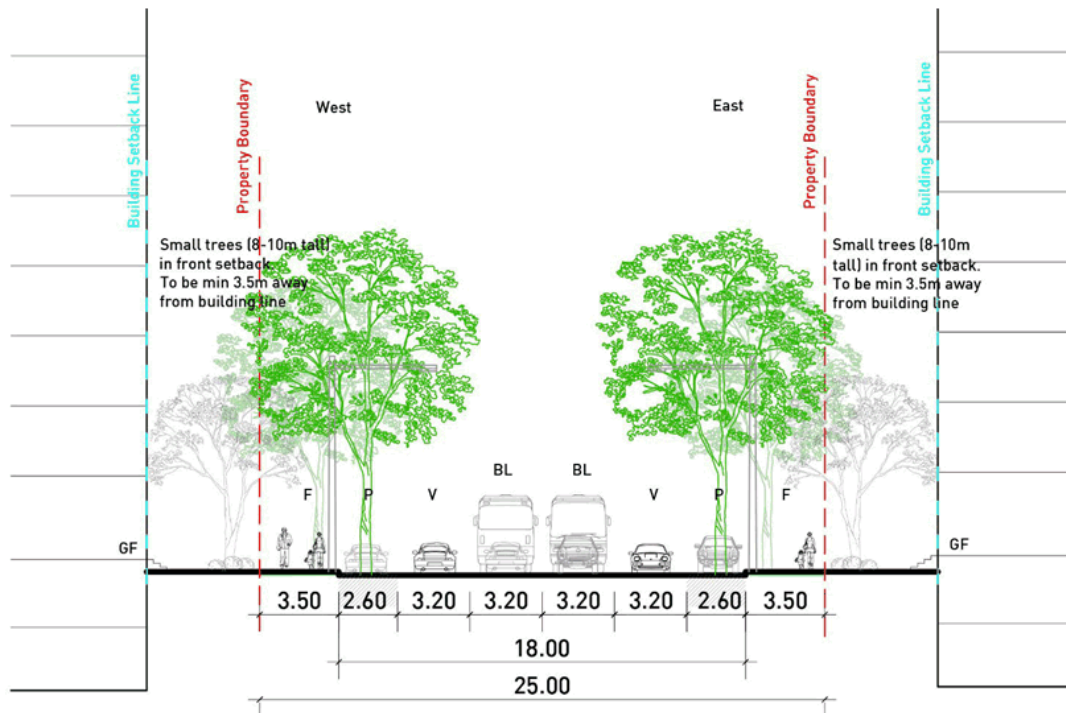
Type 1A Major Road Building to Building (NSR 2)
